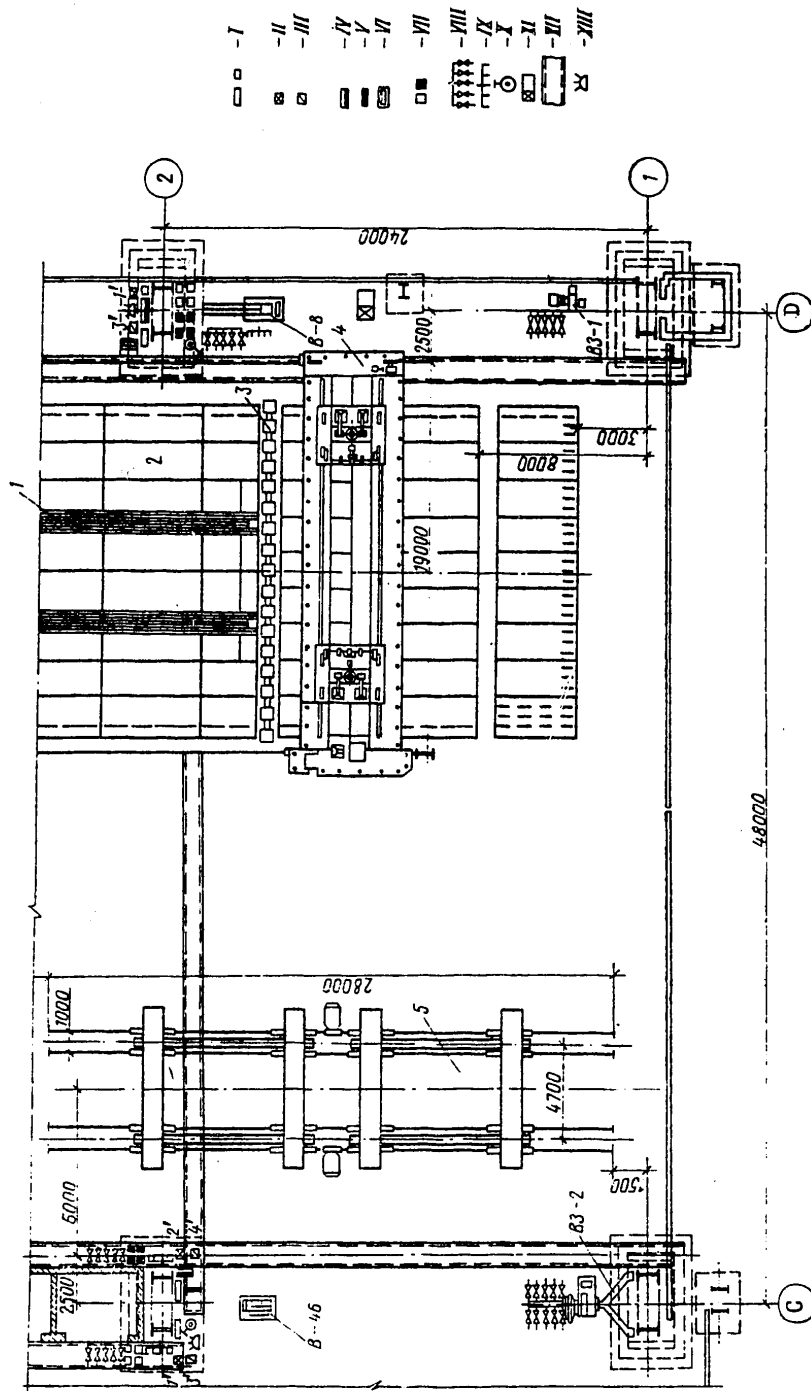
Fragment of a detailed drawing of the layout of the assembly-welding shop of class I and II shipyards
